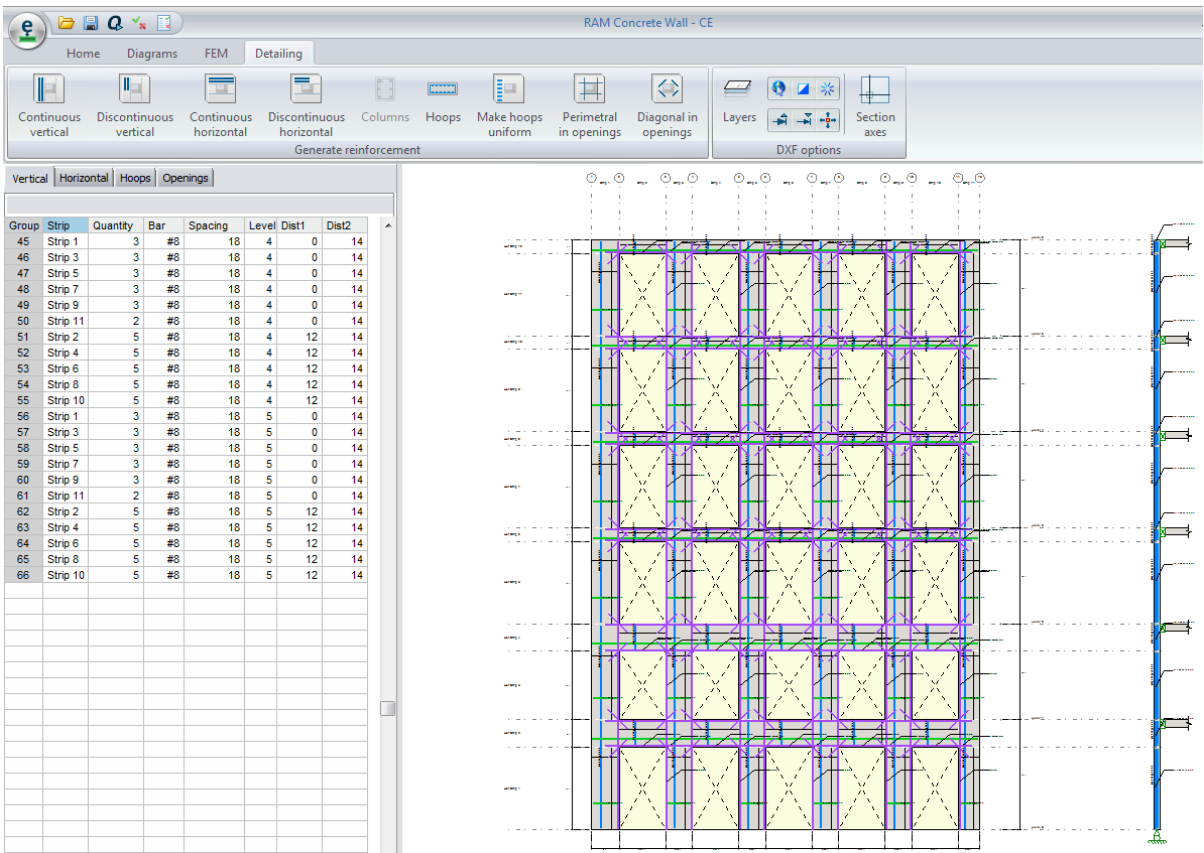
F, Vertical Reinforcement (Part 2) Design for CE
